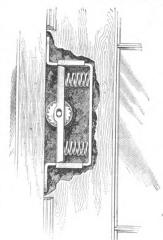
Holder in Position, with Part of Stile Cut Away.
